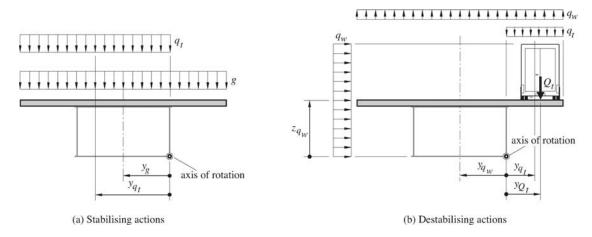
Examples of actions to consider when checking overturning of a bridge.
